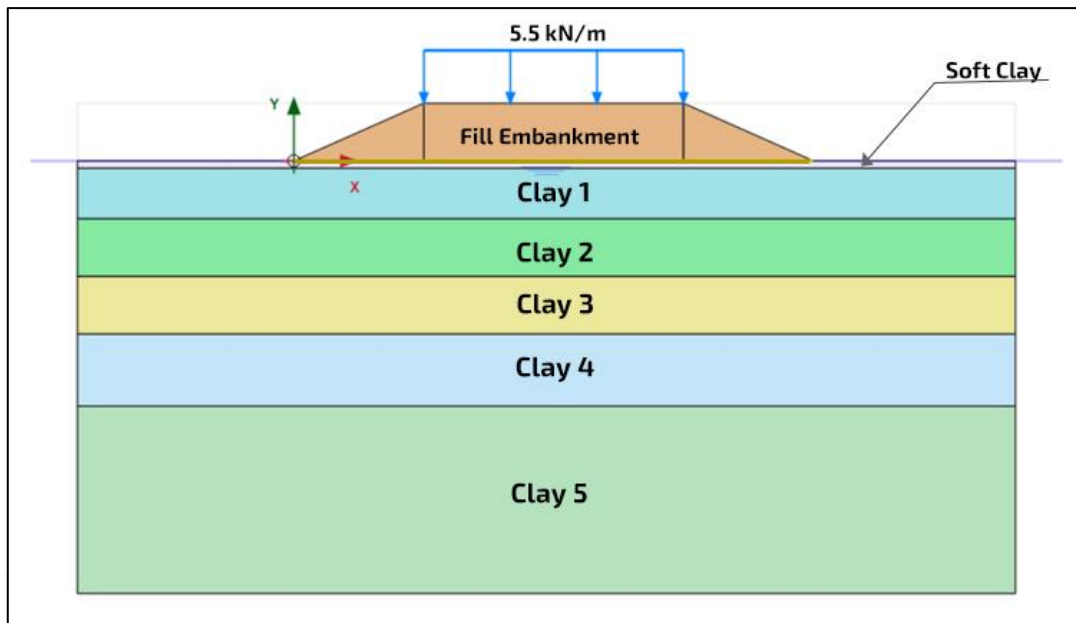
Soil and Loading and Deformed Mesh for Model -I.
